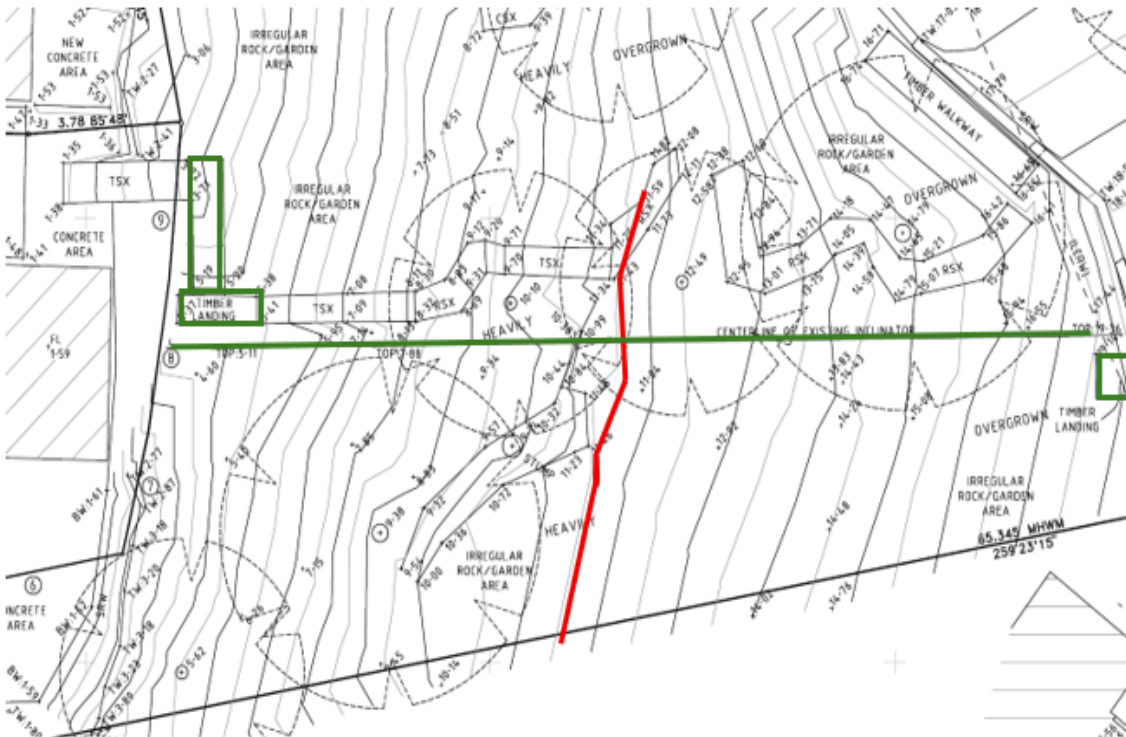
Location of Existing Inclinor and stairs to Lot 215
